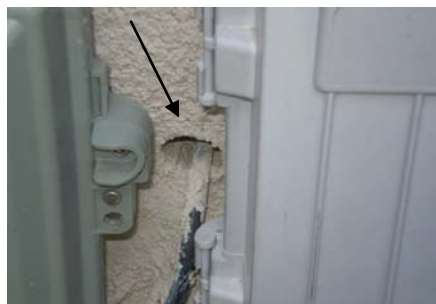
HOLES IN STUCCO AT CABLE/PHONE BOX NORTH
